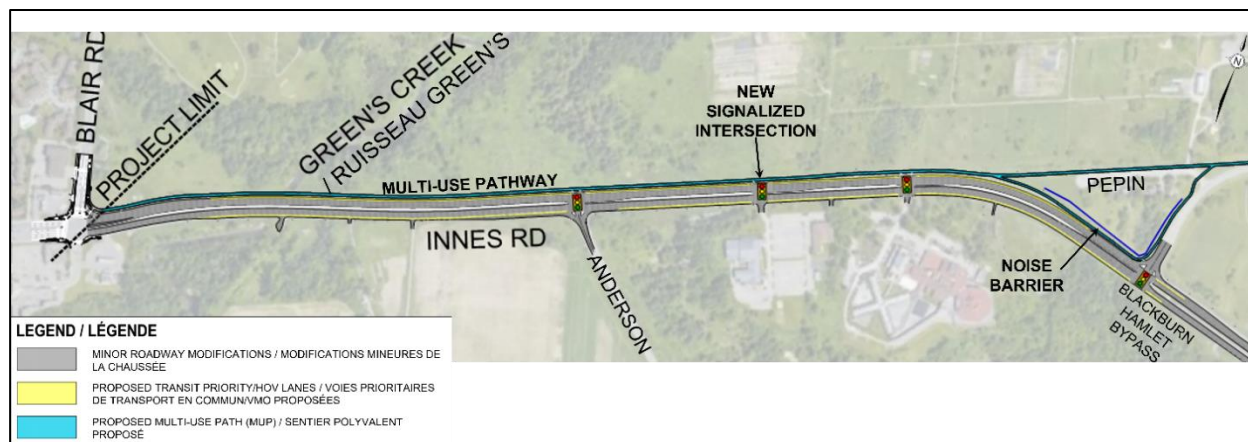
Recommended Plan Between Blair Road & Innes Road
